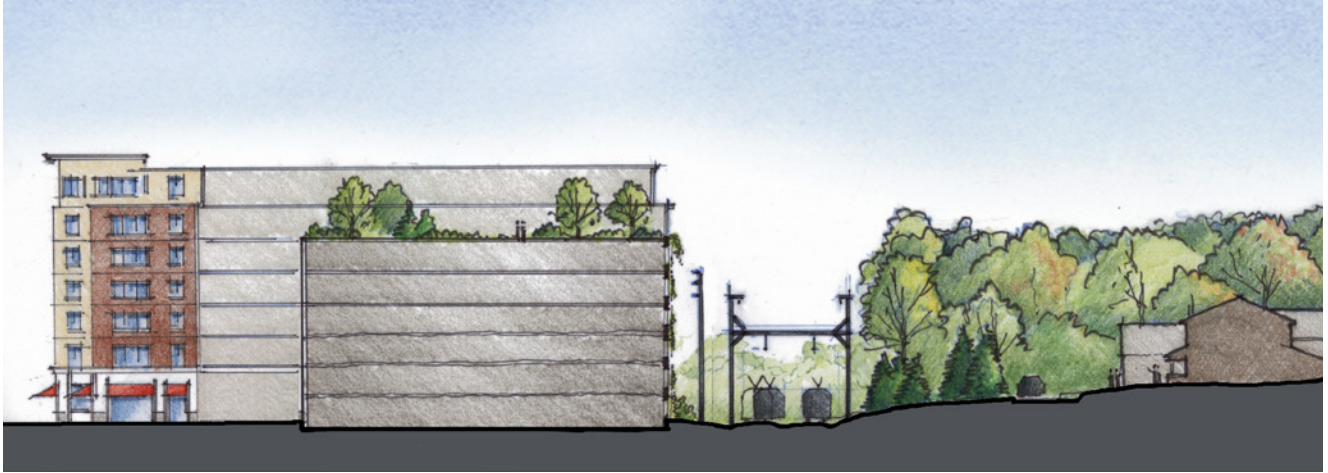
North-South Site Section, through rail line and Rodman Avenue
